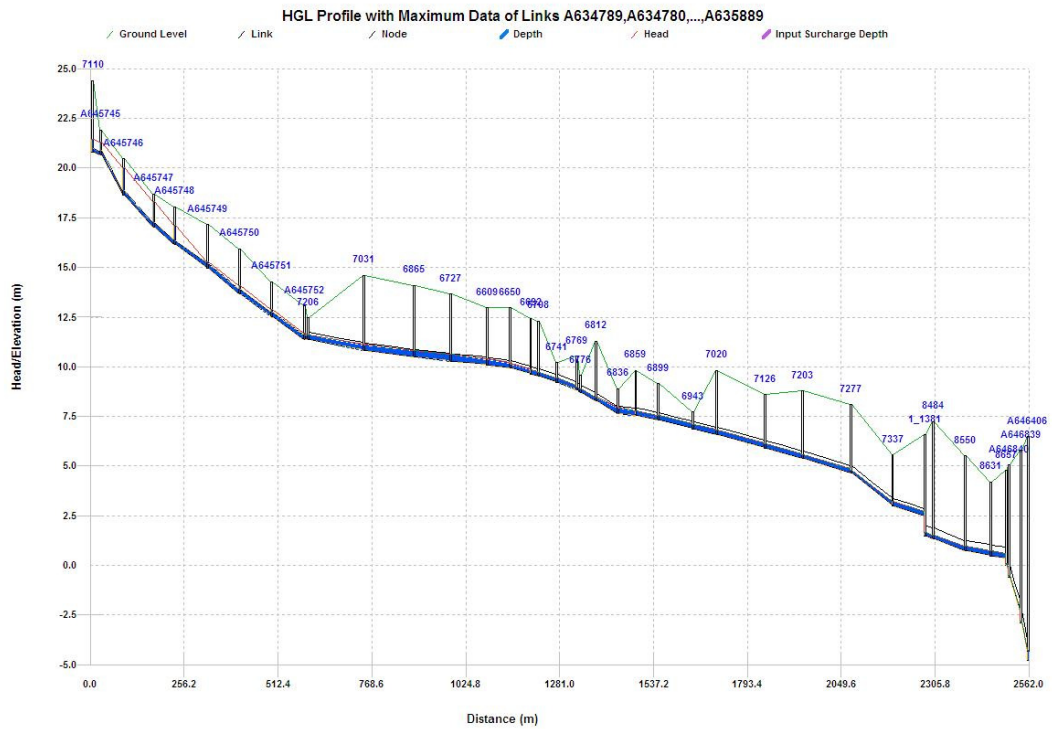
2011 Full Bellvista Stage 2 Development Longitudinal Section (Pumped to Manhole 7206)
